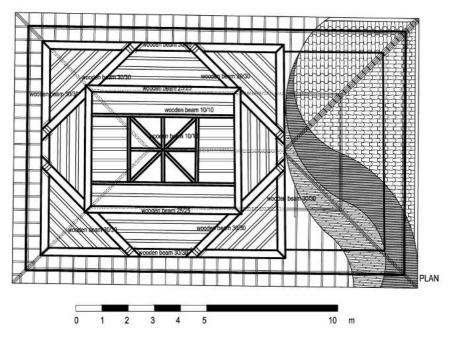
The suggested overlapped ceiling and roof solution (ART-DEM Archive)
